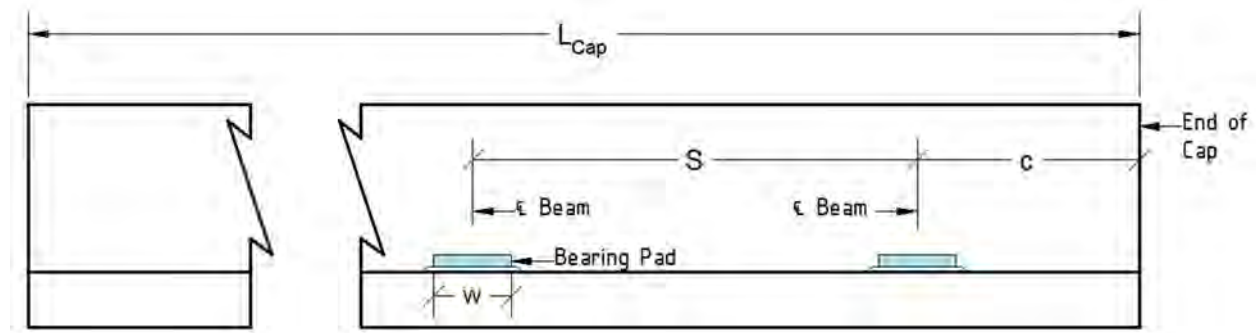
Elevation View of 30 Degrees Skewed ITBC
